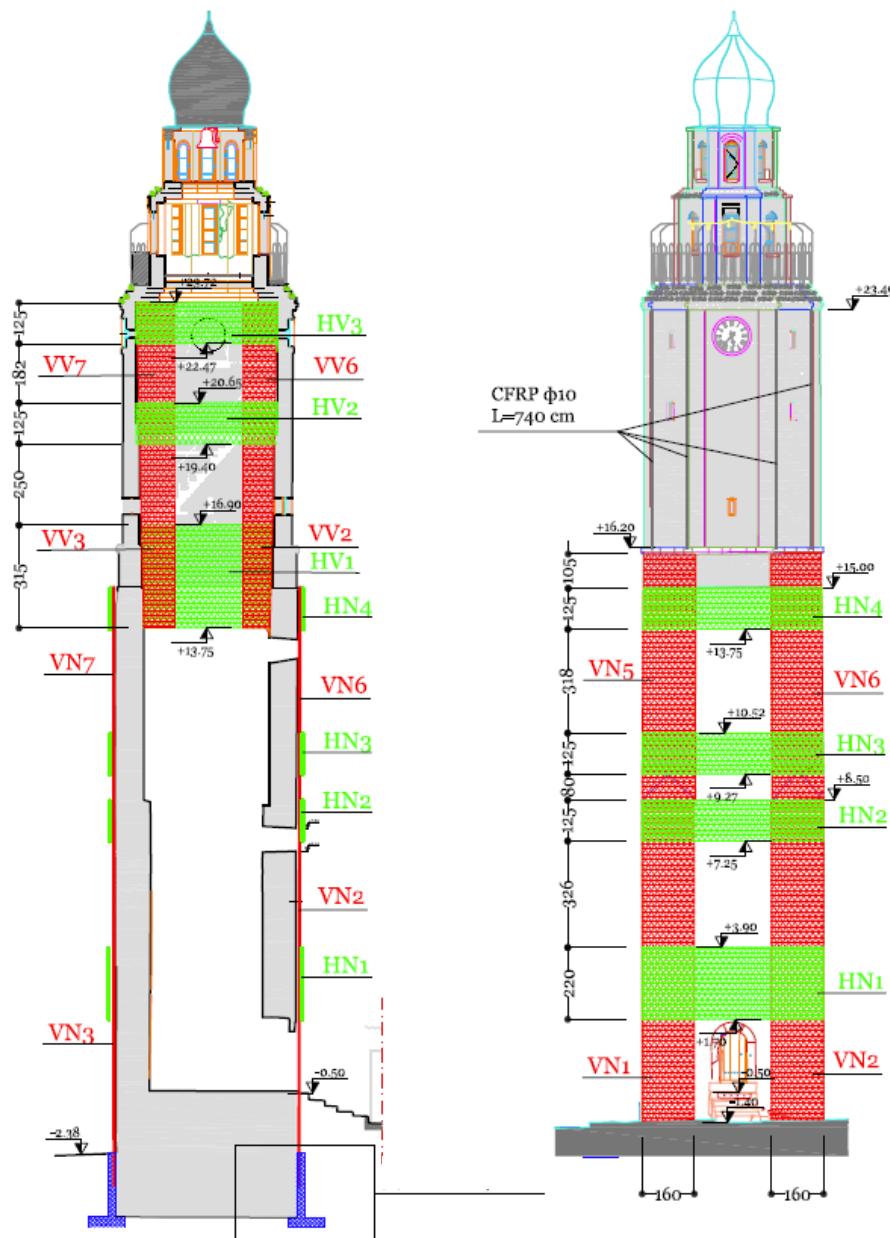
Strengthening elements – cross section (left), on the facade (right)
